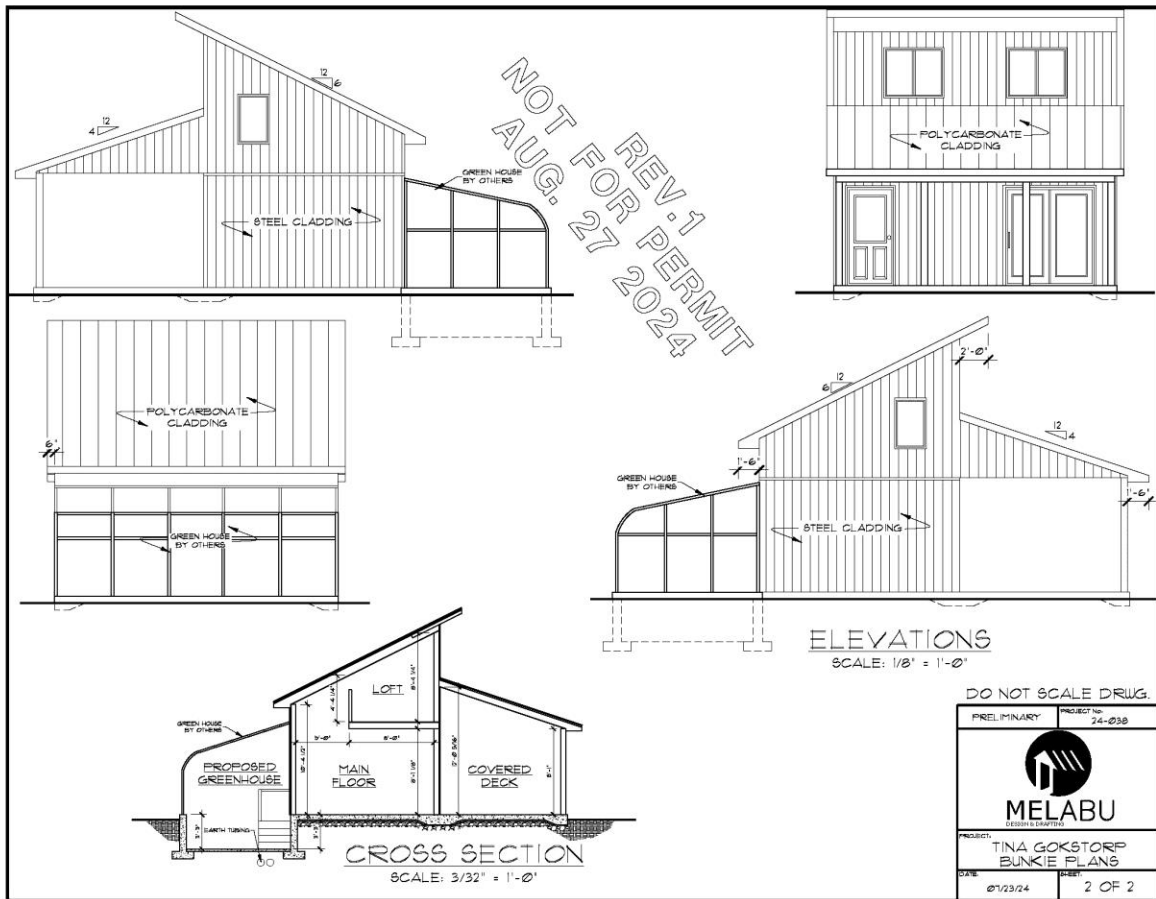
Preliminary Drawings of Proposed Farm Vacation Suites (Bunkies)
